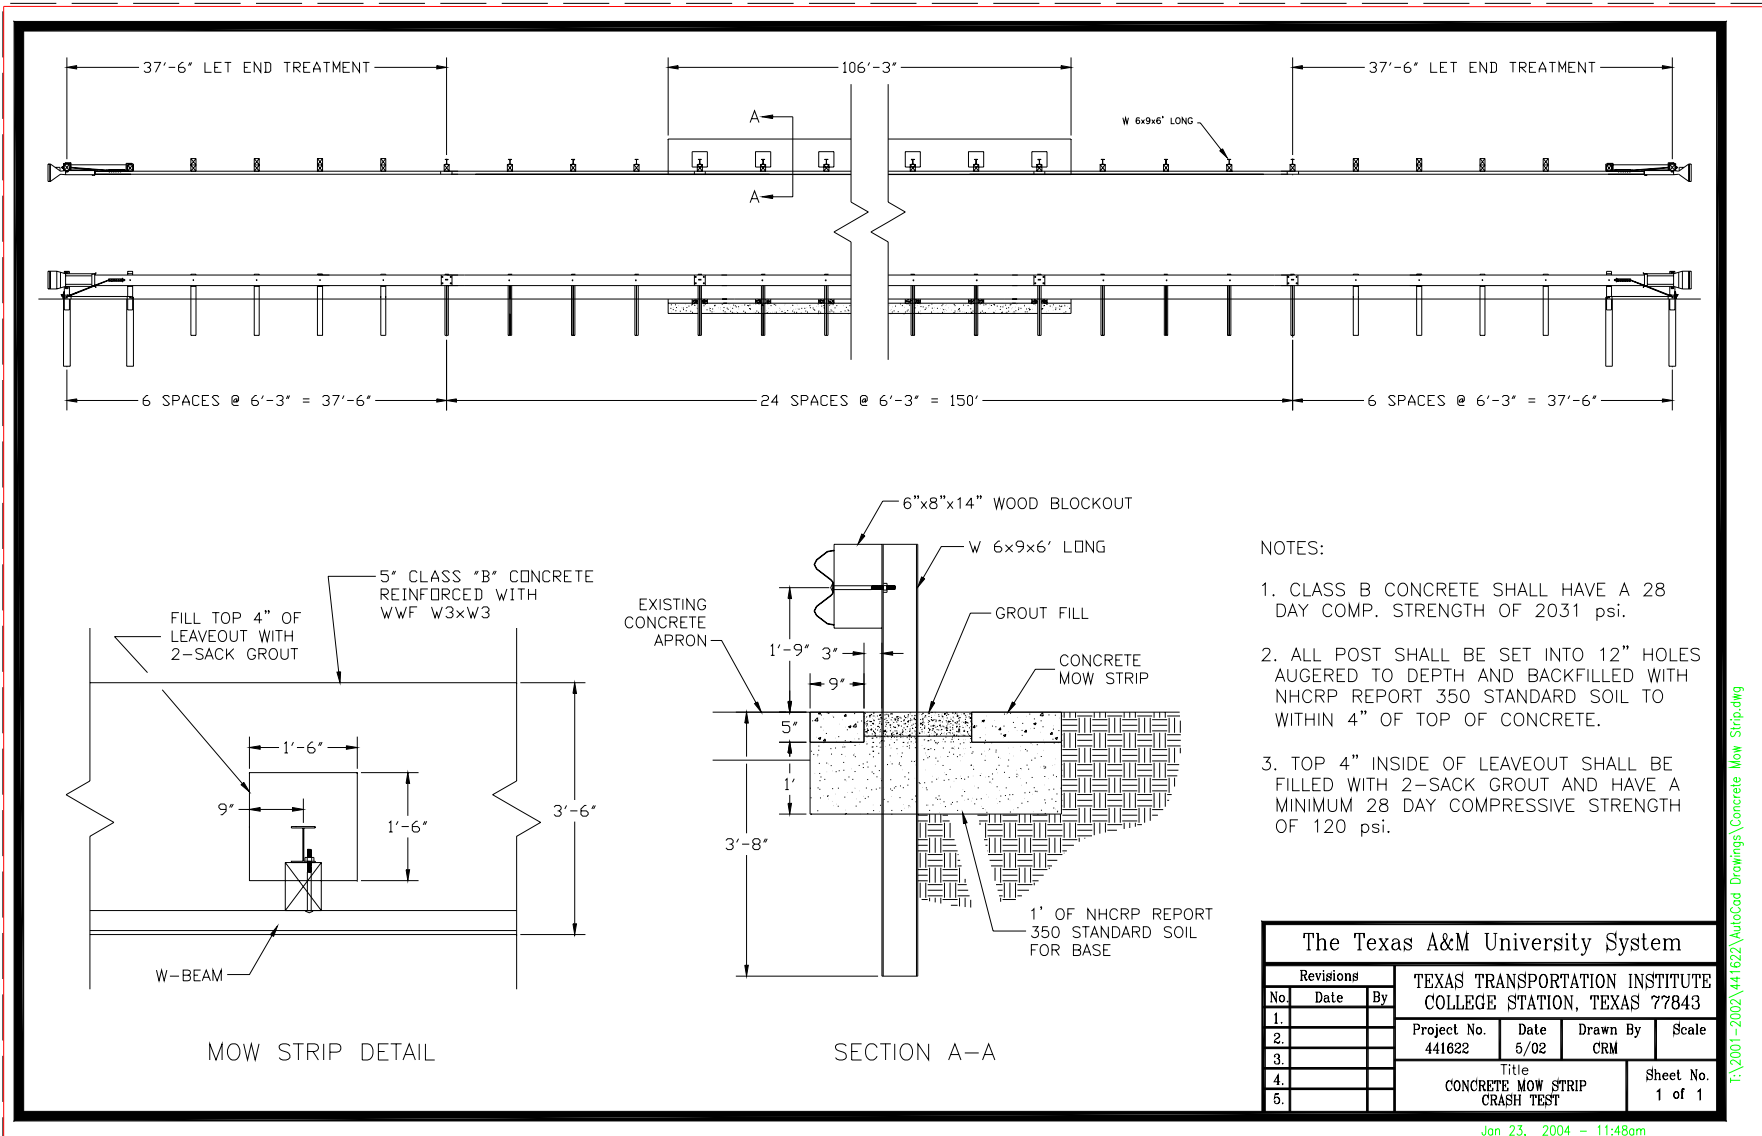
Details of the Steel Post Guardrail in Mow Strip Installation.
